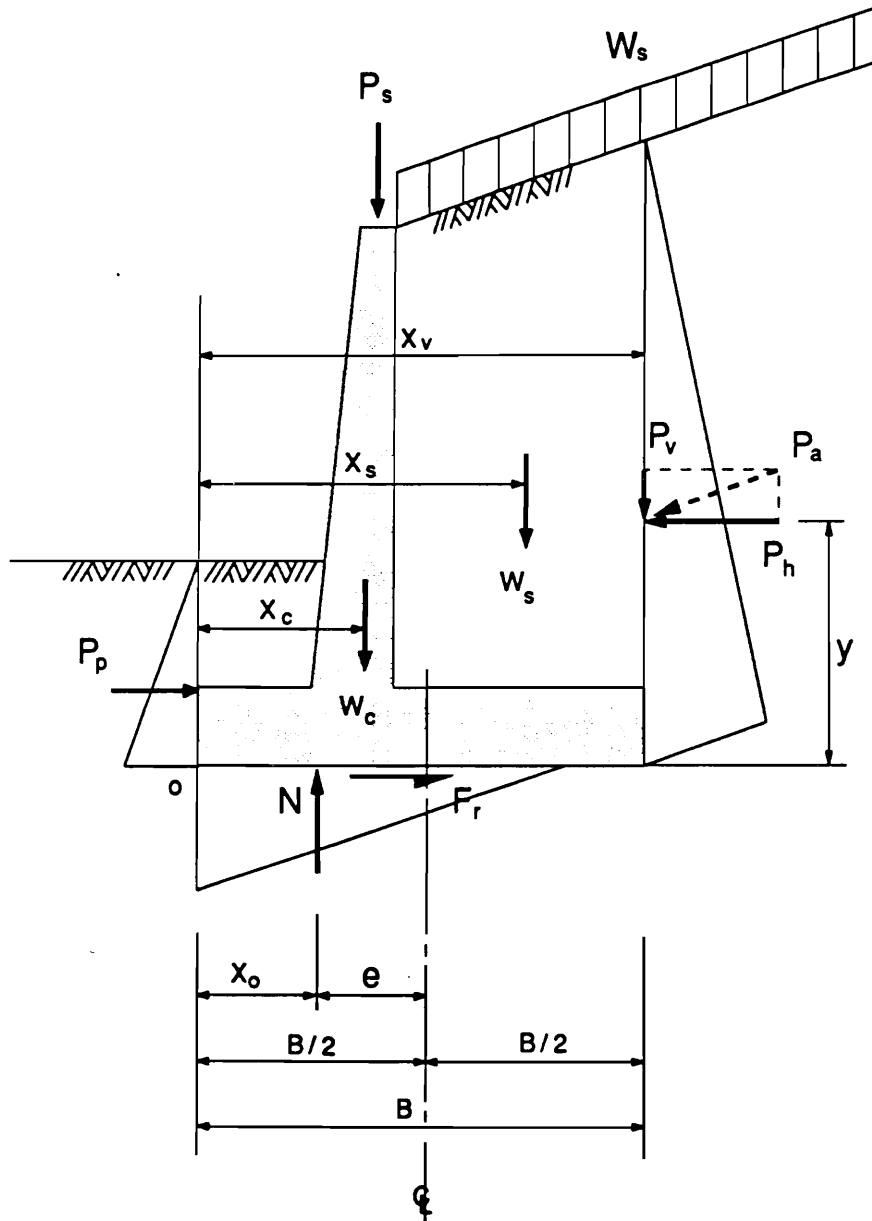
Forces on a Typical Retaining Wall or Abutment
